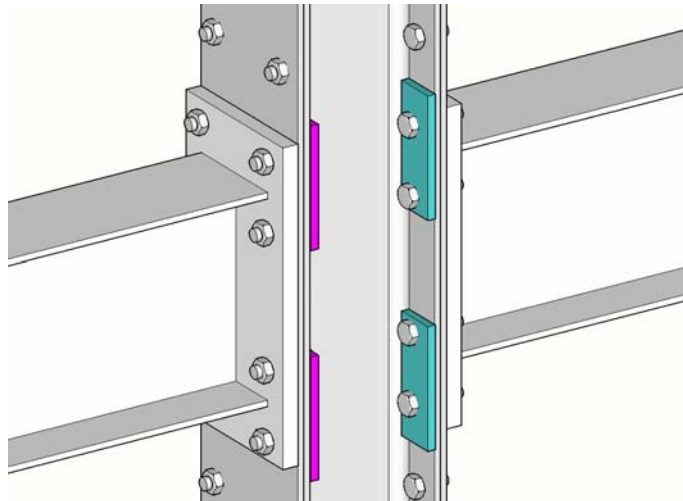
Conceptual view of simplified bolted stiffeners for beam-to-column connections.
